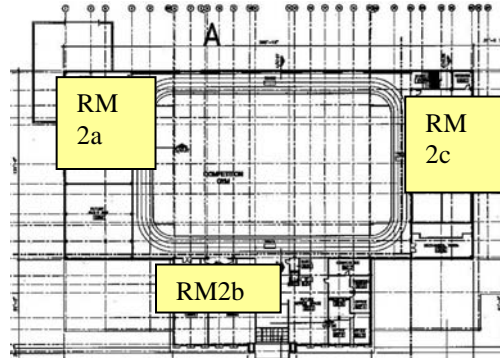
Rec Center 2nd Floor Mechanical Room Locations
